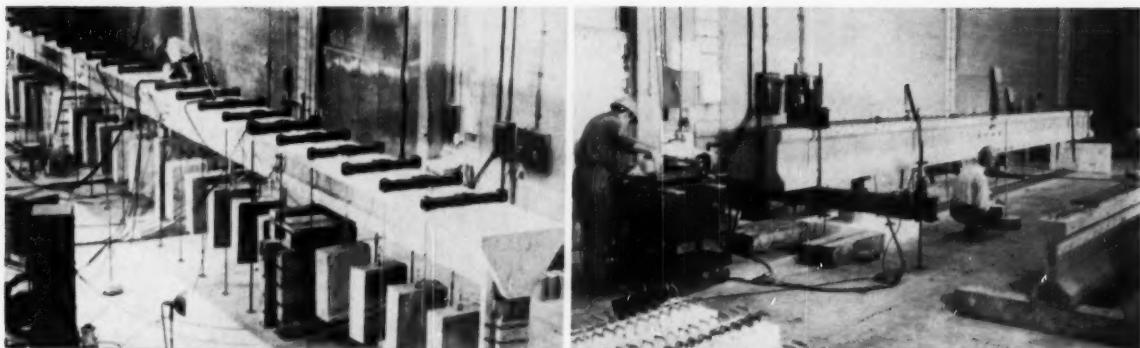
Precast continuous bridge was constructed in three stages. Continuity was created for live loads only by the embedment of deformed reinforcing bars longitudinally in the cast-in-place deck slab over the interior supporting piers.
